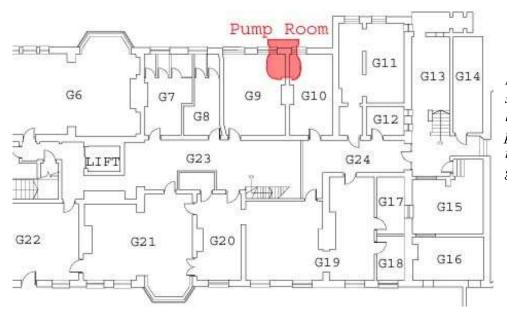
Plan showing the location of the pump room, in relation to the ground-floor.
